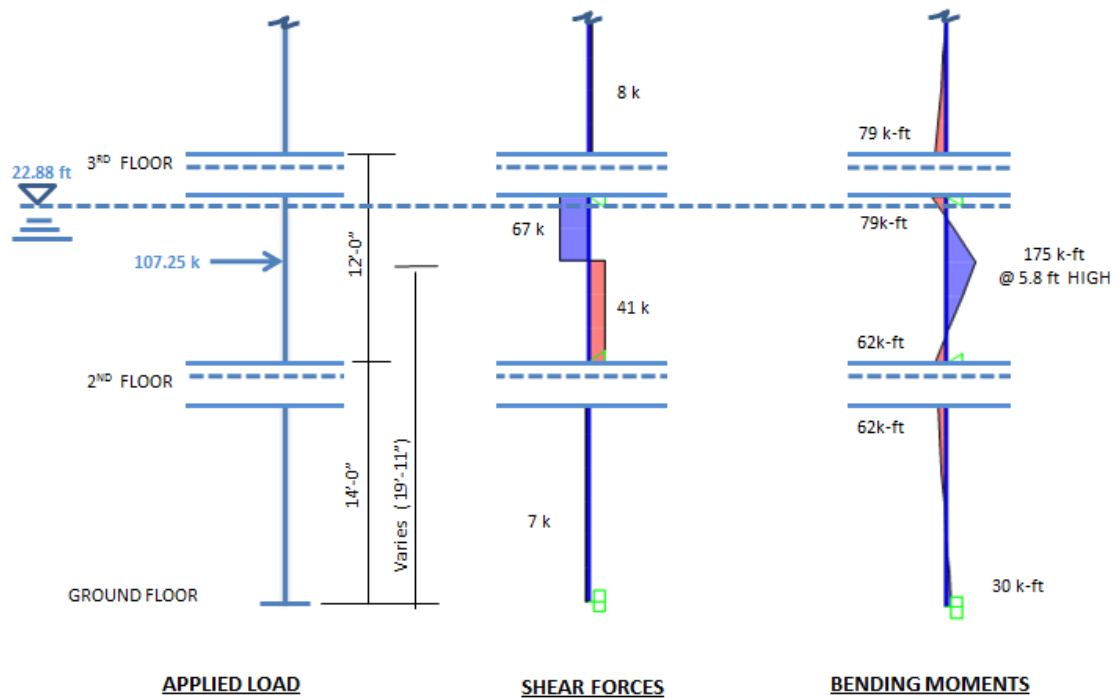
Impact load applied at " $d + h_c$ " away from the end of column on the 2nd floor
